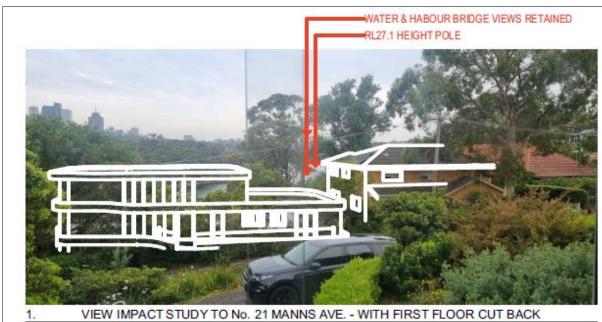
Amended design with sightline corridor retained after 1st floor reduced.
